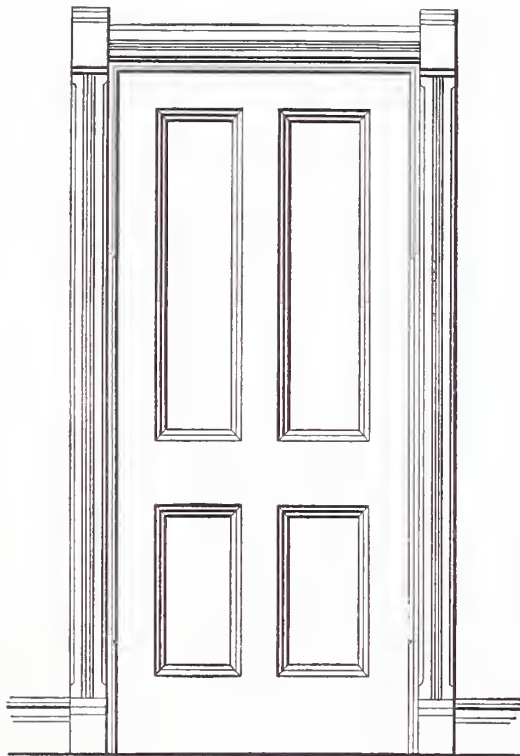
Elevation of Door.—Scale, $\frac{1}{2}$ inch to the Foot.
